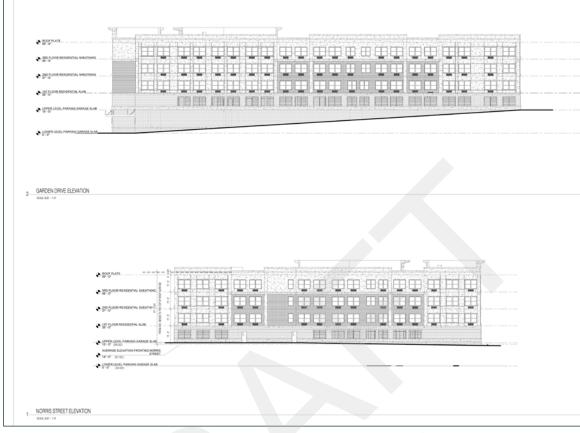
Conceptual Building Elevartions Courtesy of Mistry Design
